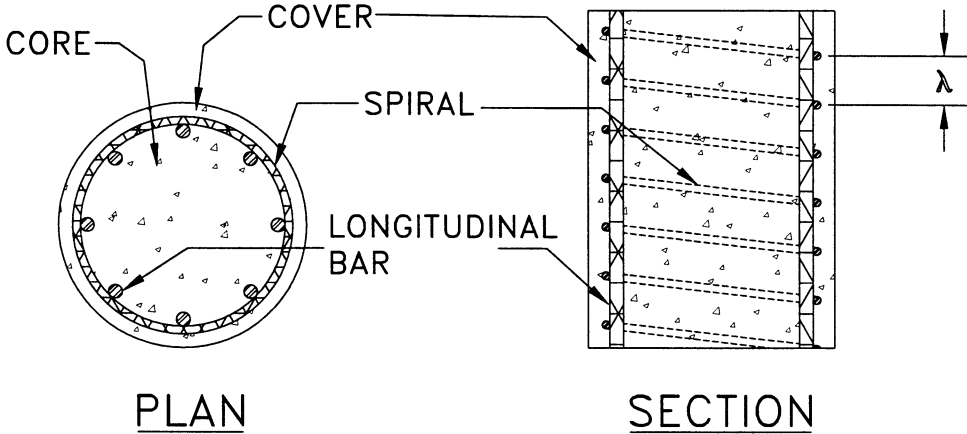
Typical seismic resistant cylindrical reinforced concrete column
